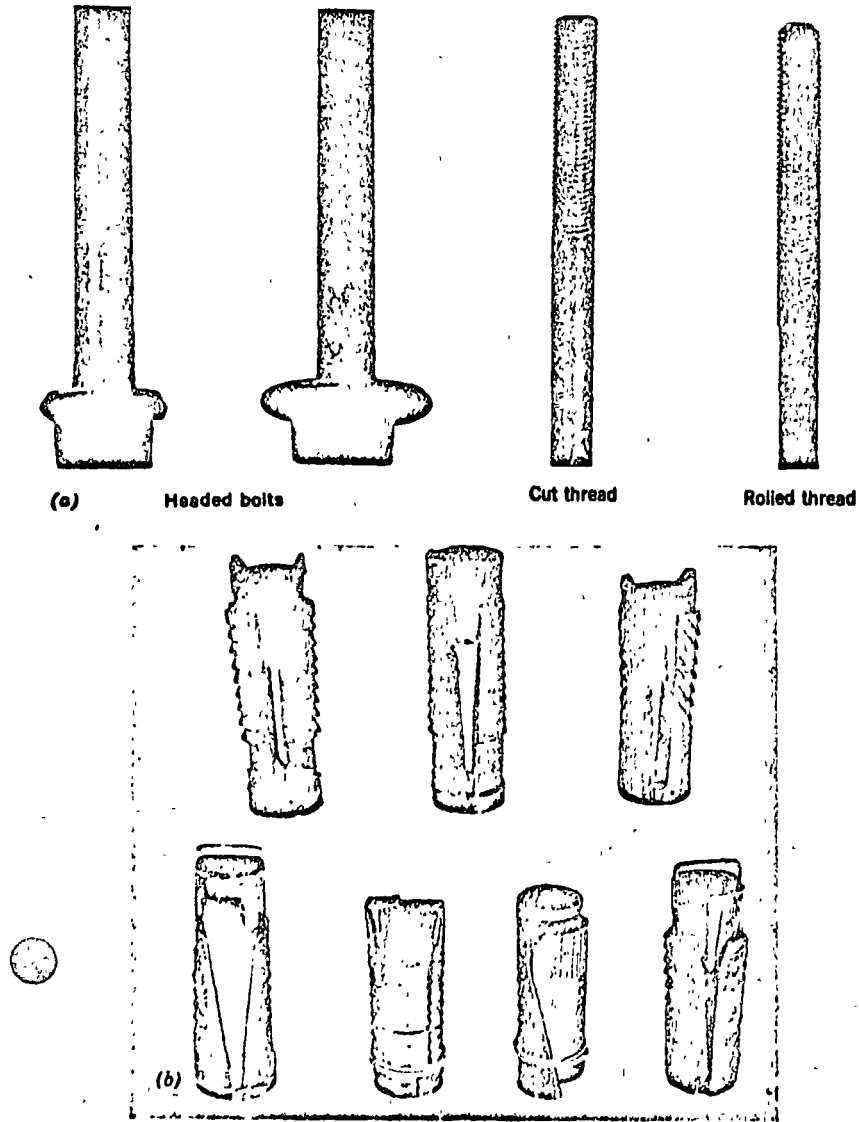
(a) Expansion-type rock bolts. (b) Expansion shells and plugs.
